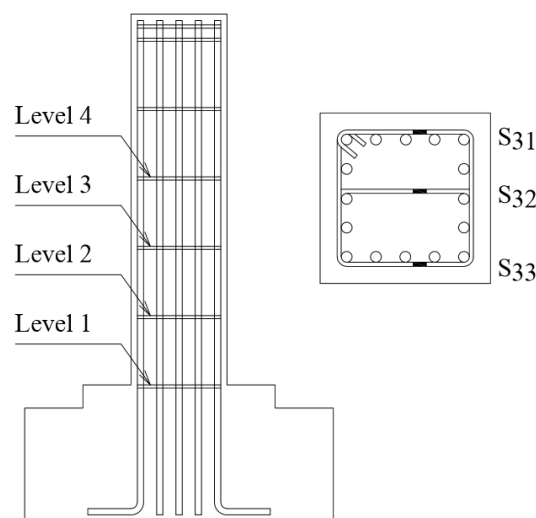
Installation of strain gauges on ties a) elevation and b) section at level 3.
